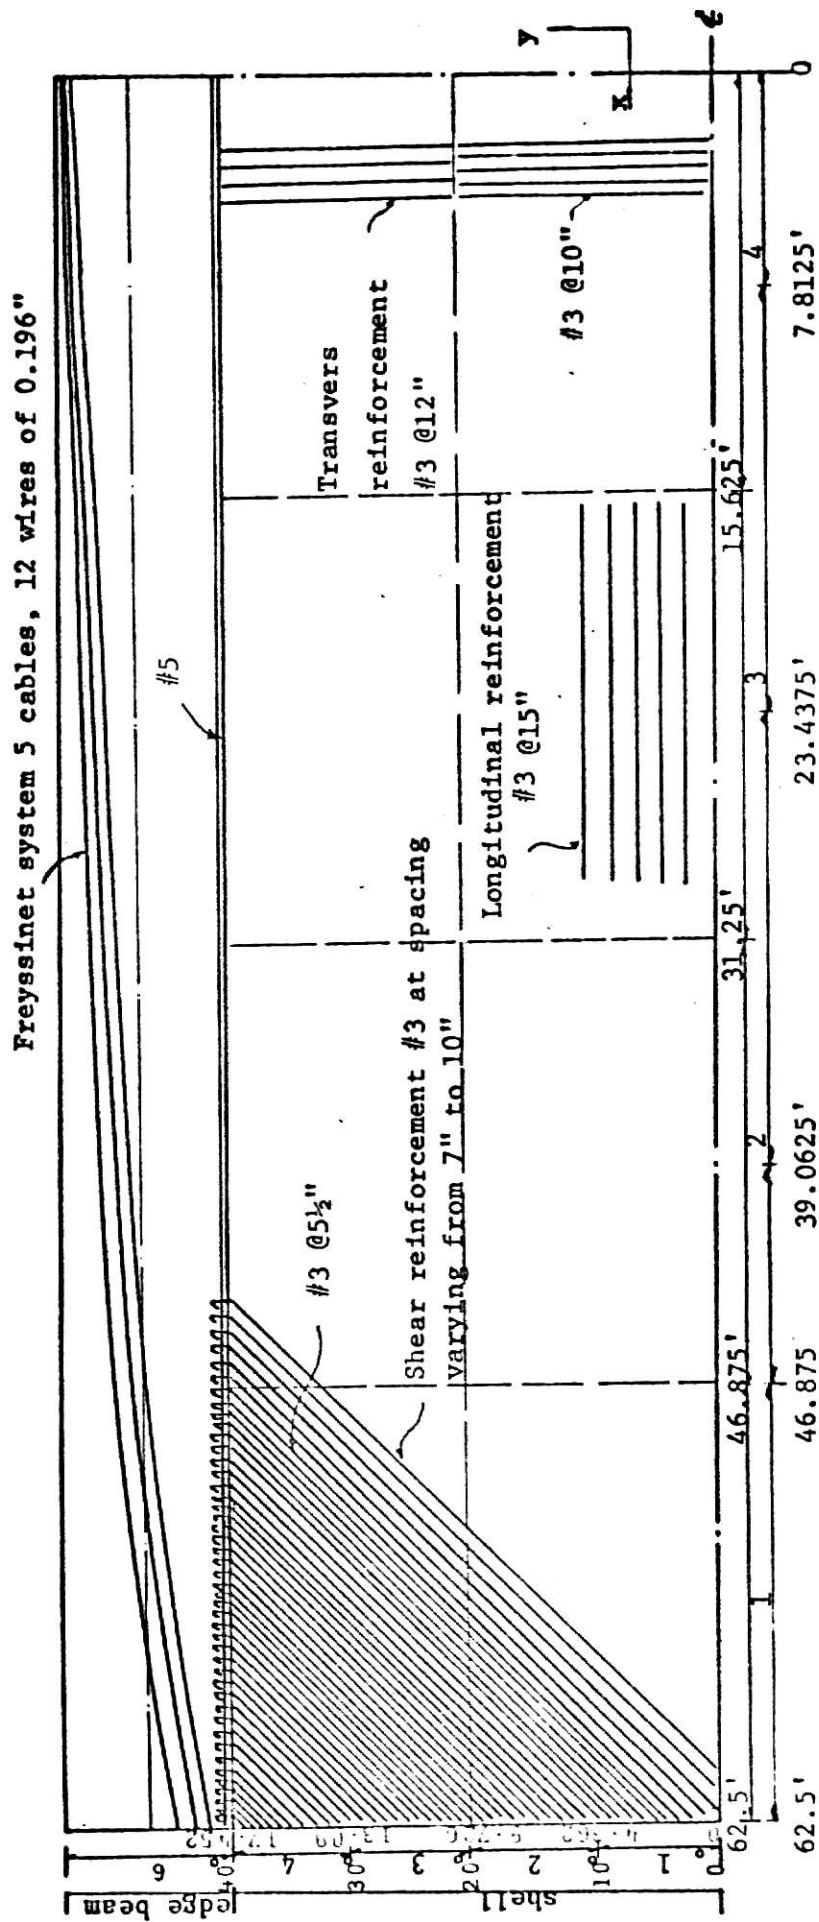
Cables and Reinforcement Placement of P/C Shell with Edge Beams
